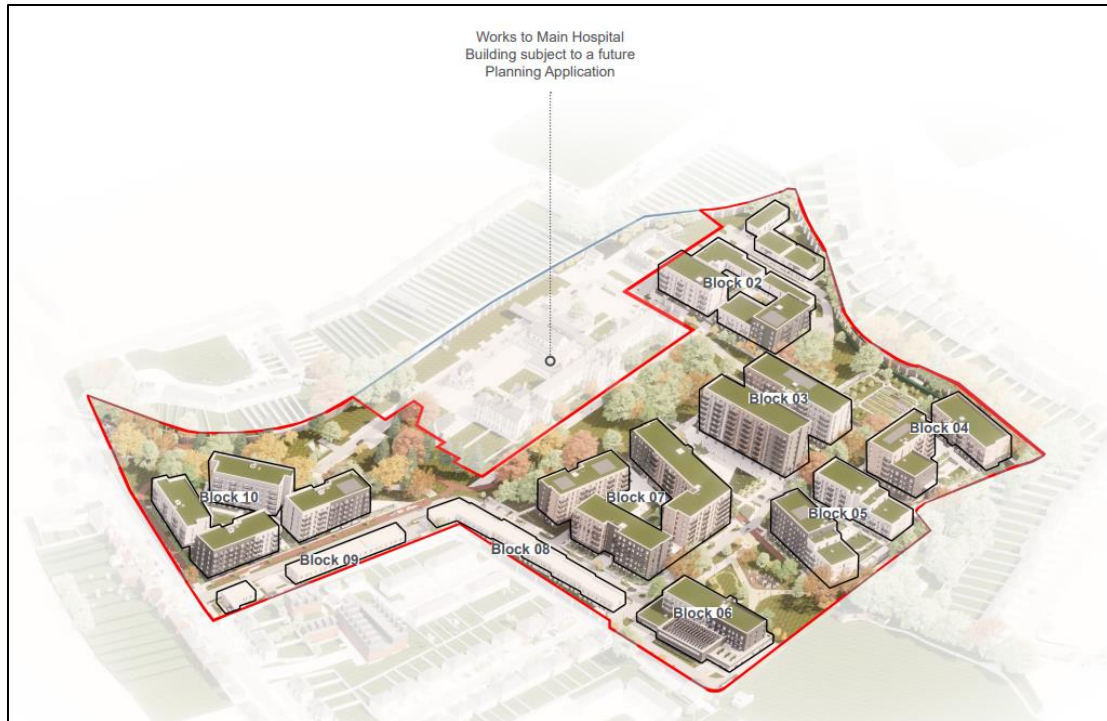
Extract from Reddy Architecture and Urbanism's *Architectural Design Report* showing the proposed site layout.
